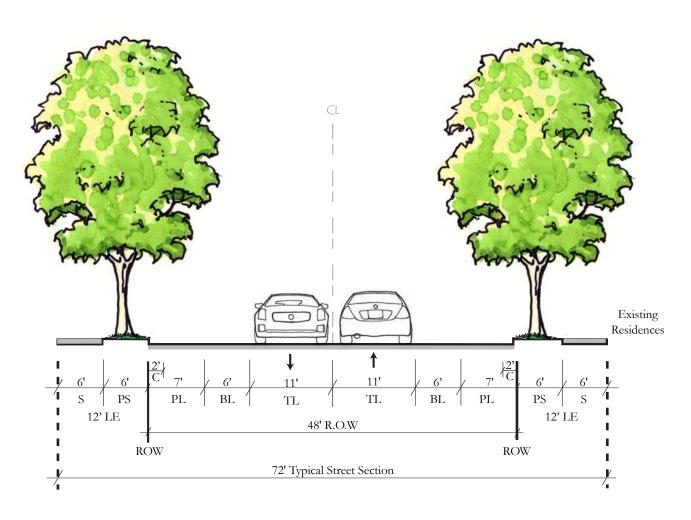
Major Collectors (Cherry Street / Sanborn Road South of Lincoln Road) Section F
